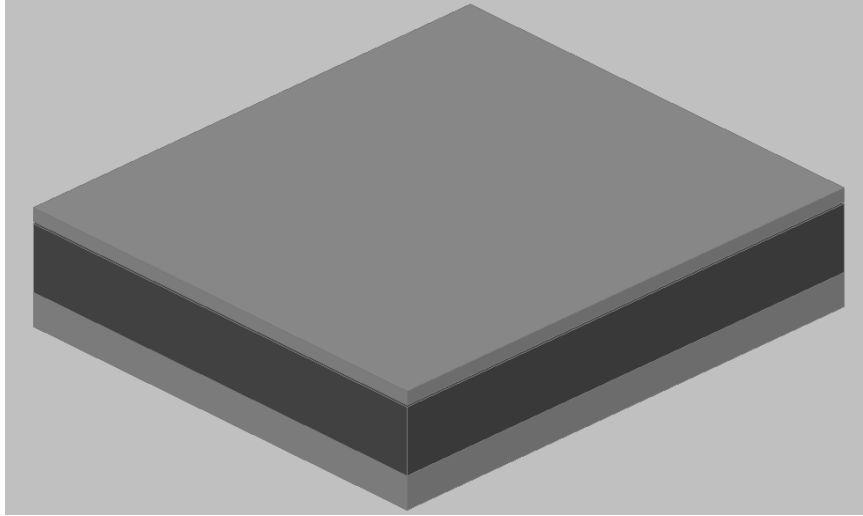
Chart. Three dimensional design of the Assembly Design VII.
